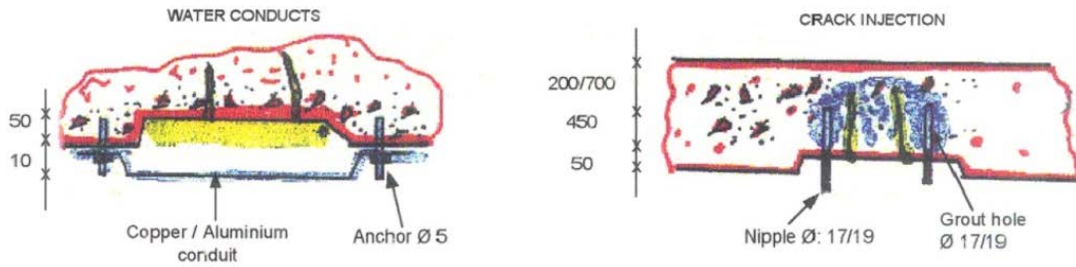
Copper or aluminum conduit along with crack injection used to convey water penetrating a concrete liner (Russell, 2001)
